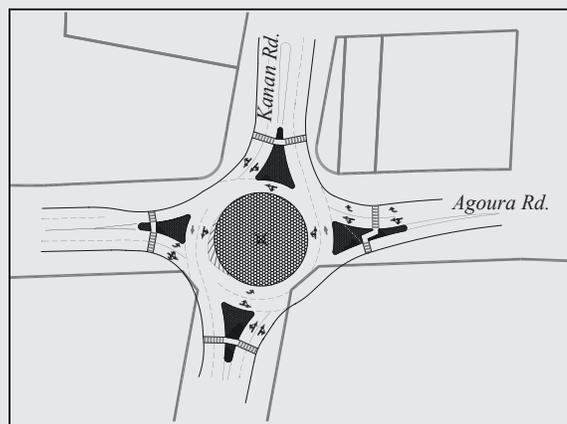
Concept diagram of Agoura Road and Kanan Road roundabout, subject to final engineering approval
